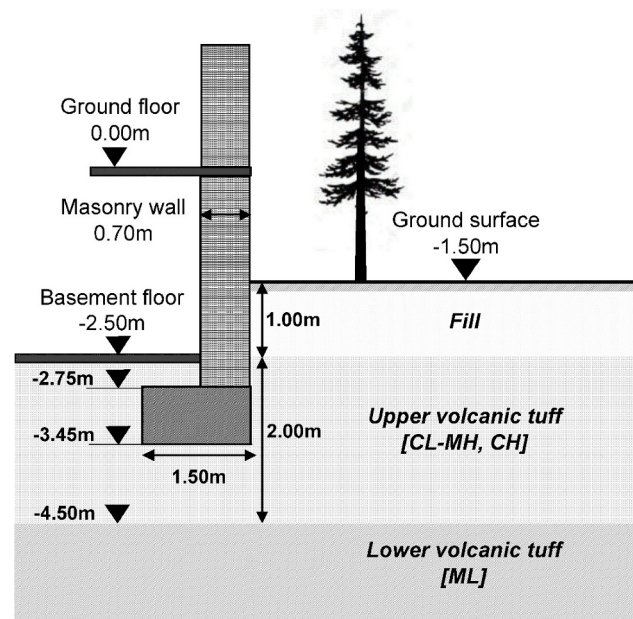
Cross section of the soil profile along the NS direction and close to BH2 and T2.
